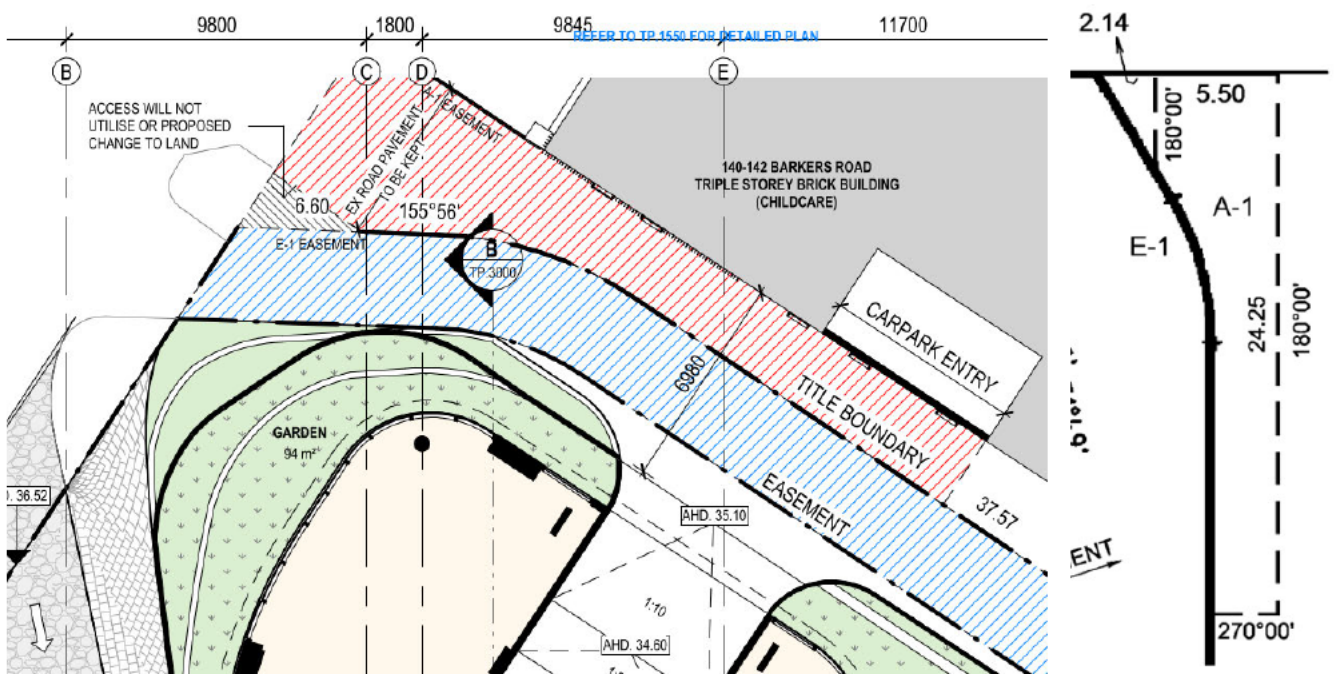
Ground floor plan excerpt showing the E-1 easement (blue) and A-1 easement location in context with the proposal and existing laneway and excerpt from the plan of subdivision showing easements (right)
